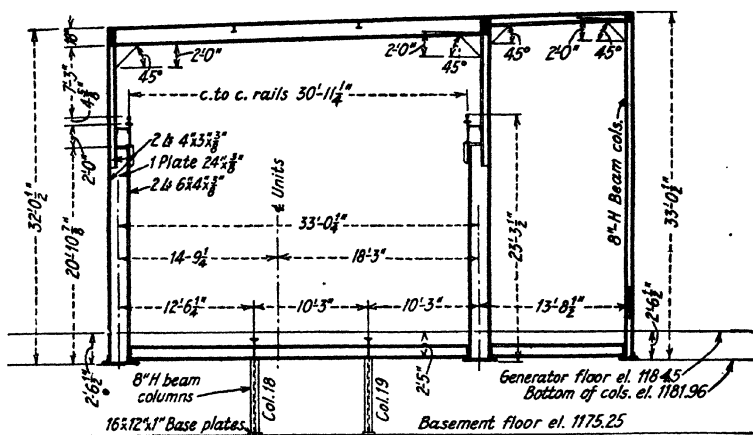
Power House Steelwork, Soft Maple Development Northern New York
